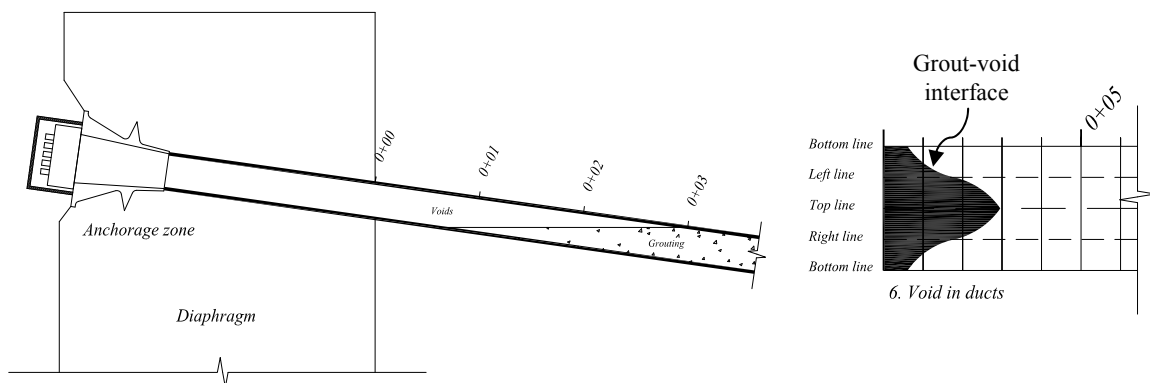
Marking Voids on the In-Depth Inspection Form.
